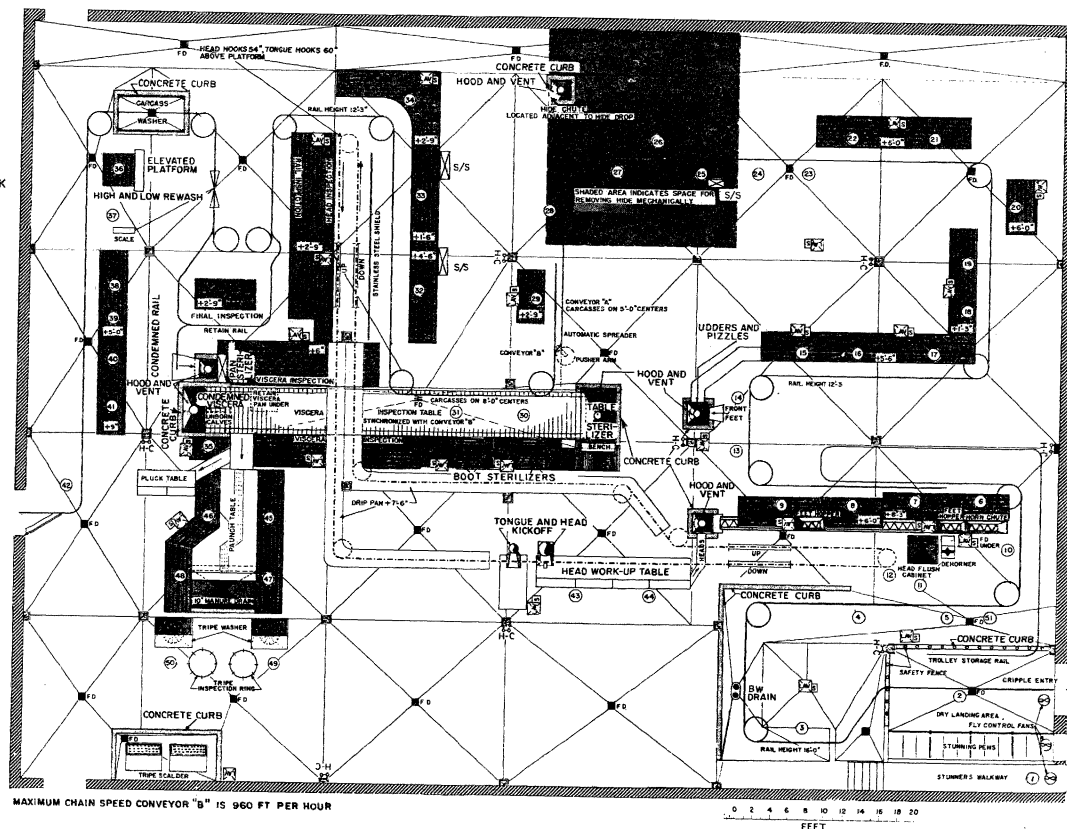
Sample layout of on-the-rail kill-floor facilities meeting Federal inspection requirements for a plant slaughtering 120 head of cattle per hour.
